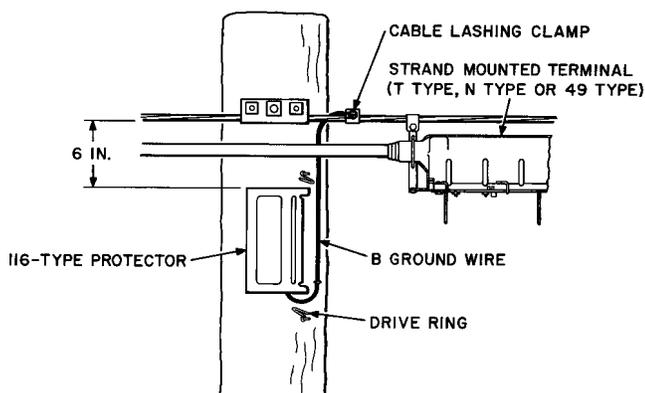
Mounting 116-Type Protector at Ready Access Terminal
